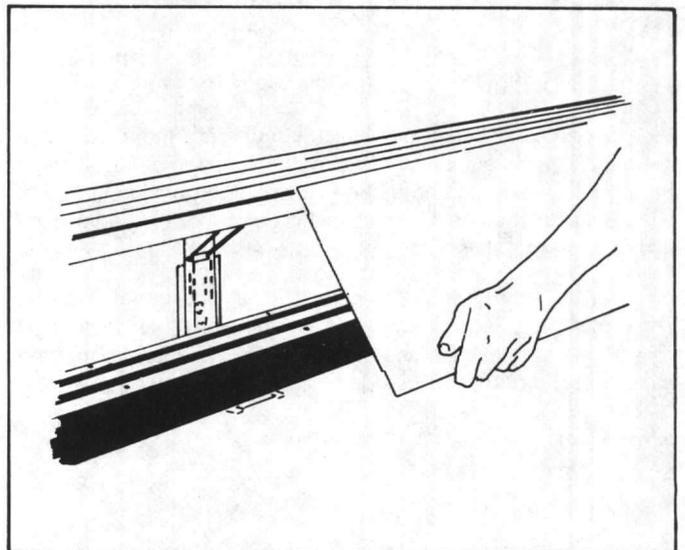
Attaching Type TA Front Panel to the Grille
